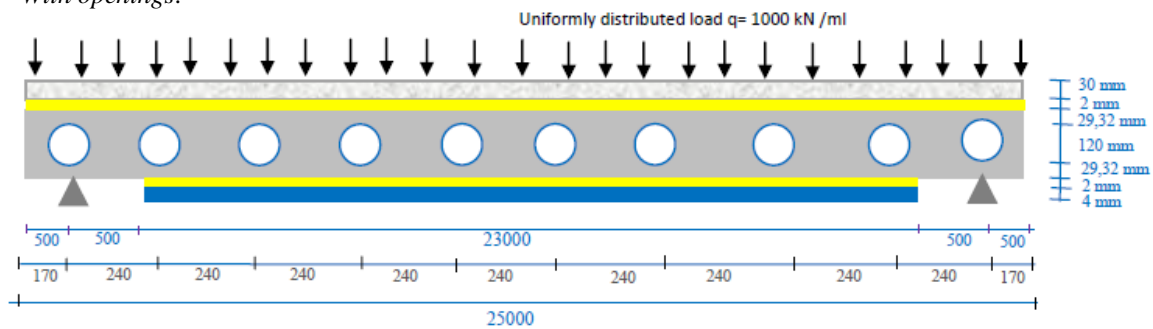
Longitudinal section: Box girder at 90° with web openings
